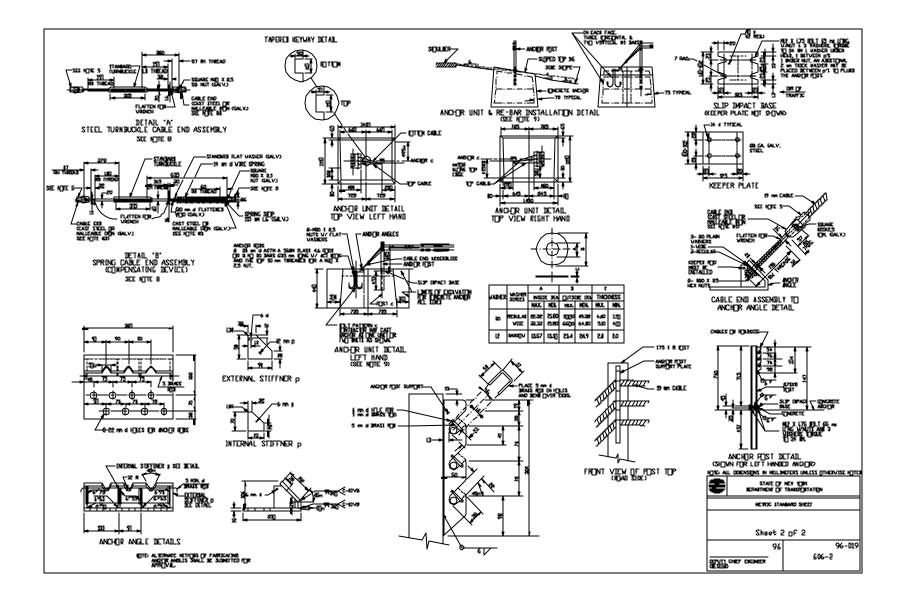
Details of the New York cable rail terminal installation for test 404211-6 (continued).
